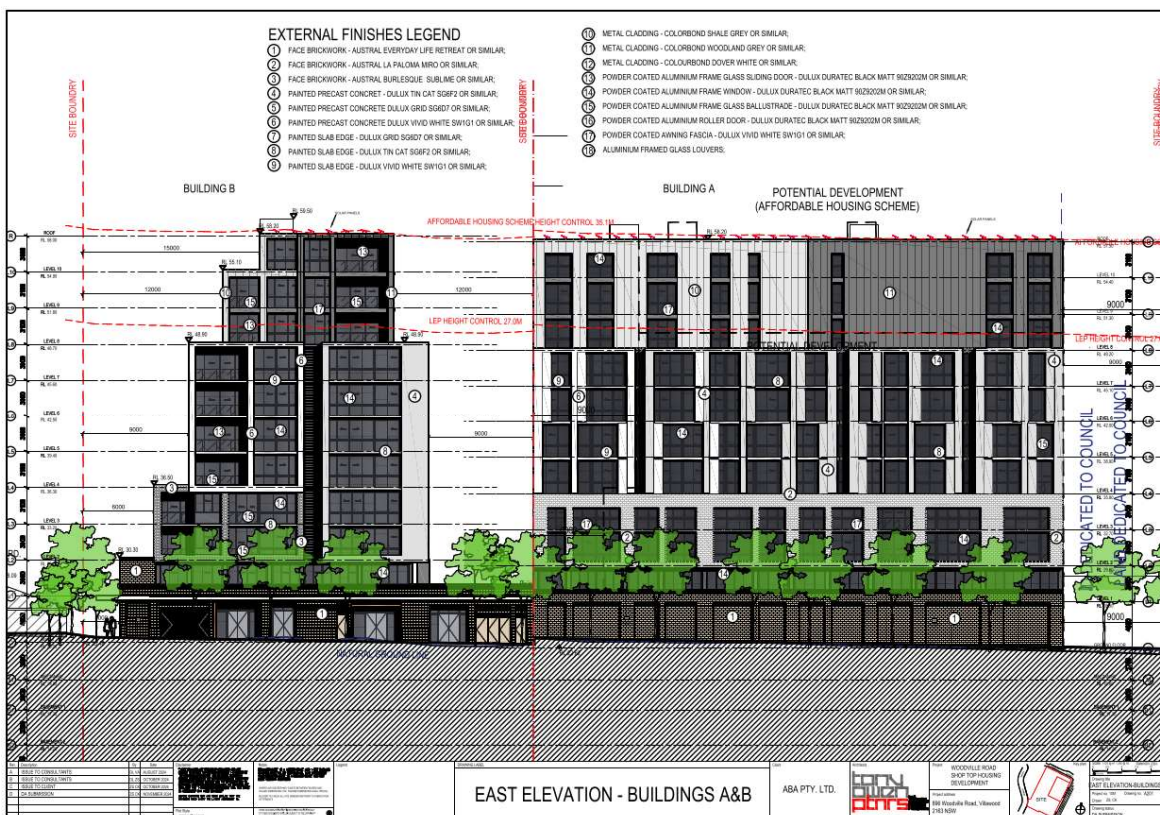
Proposed East Elevation of Buildings A and B facing Woodville Road.
